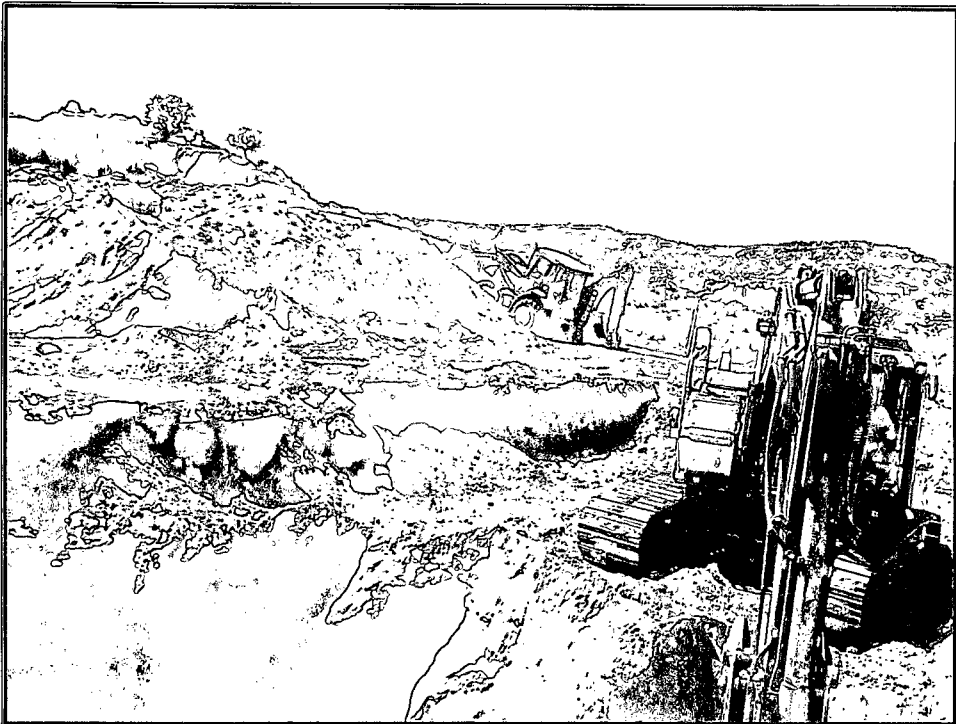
View of excavation equipment benched down to reach the base at approximately 25'.
